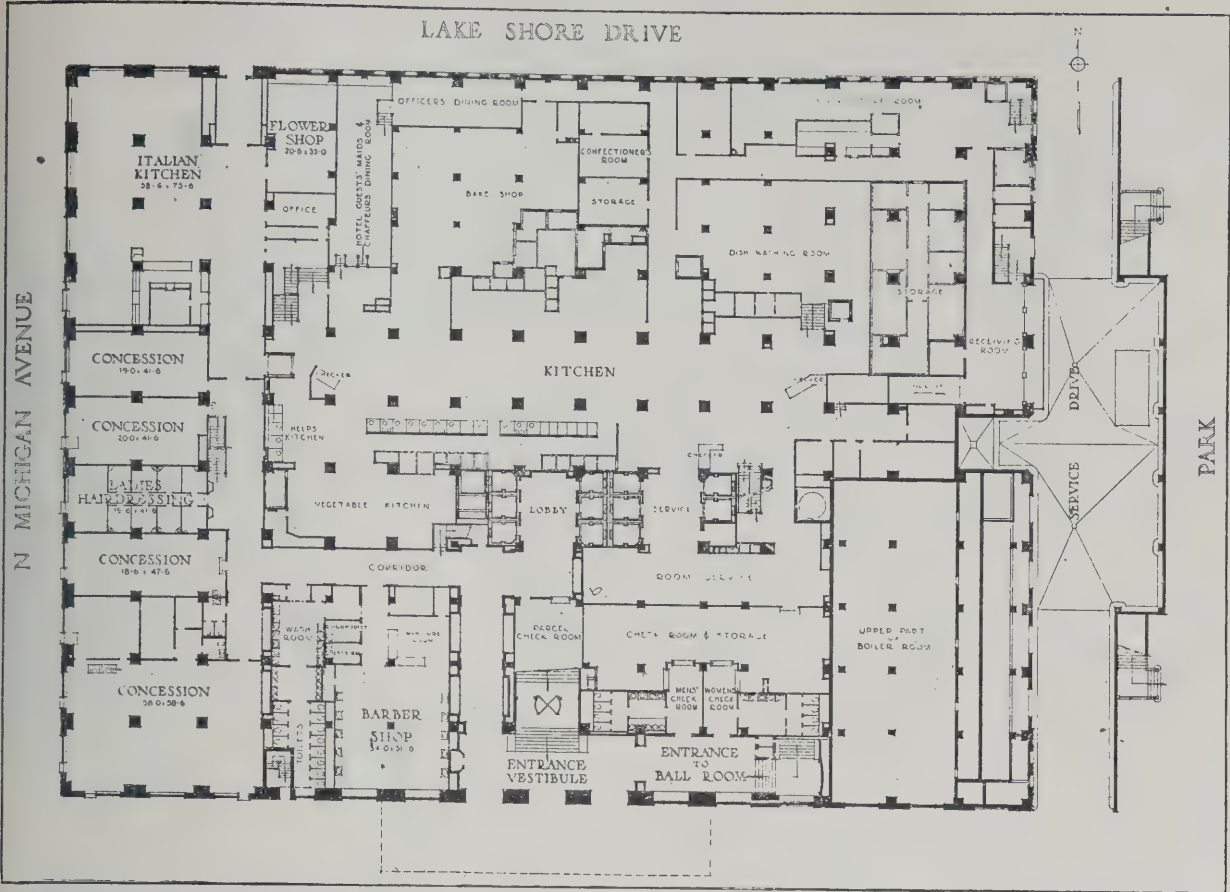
THE DRAKE HOTEL, CHICAGO: LOWER GROUND FLOOR, SHOWING KITCHEN AND SERVICE LAYOUT.
